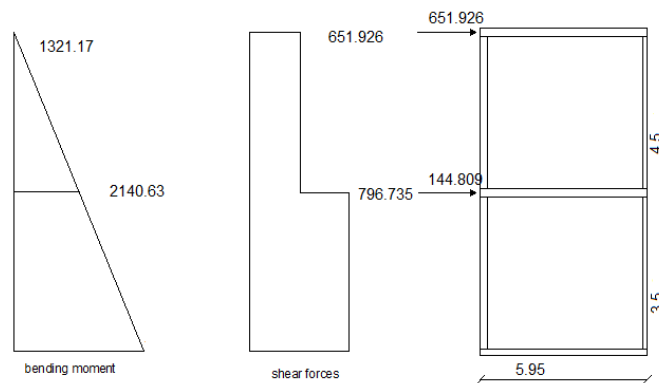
Shear & Moment Diagrams of Shear wall
